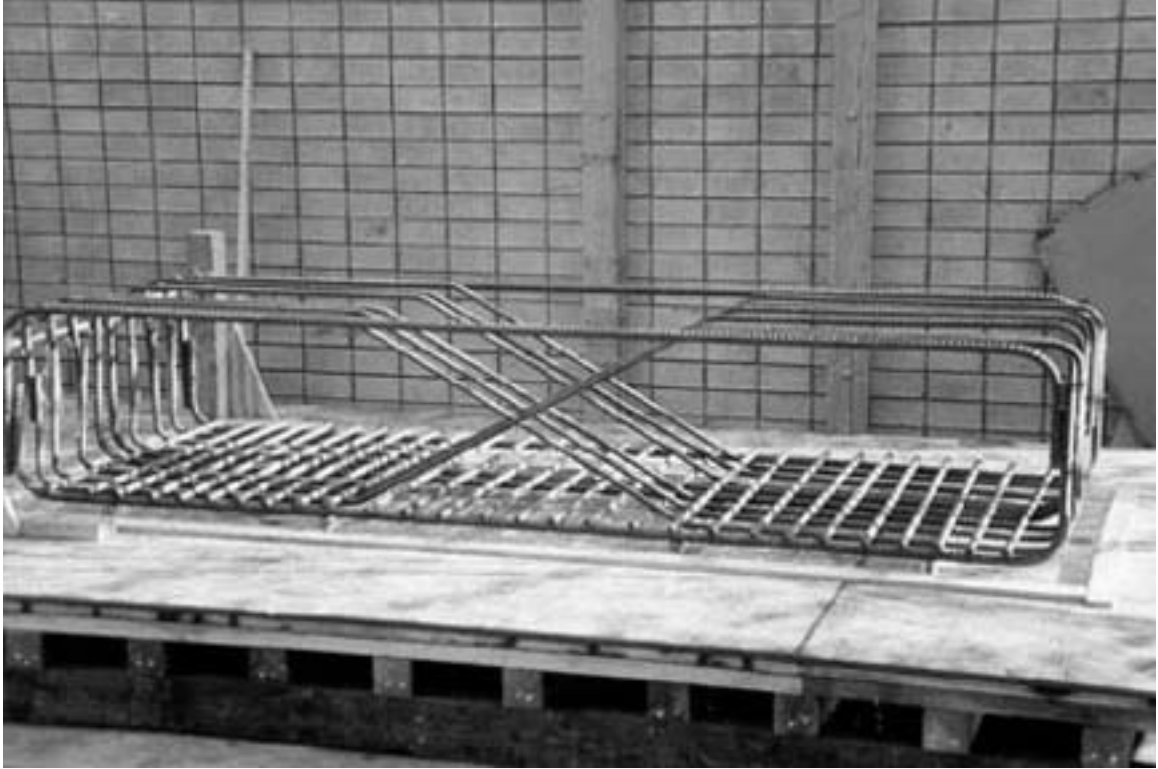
Footing longitudinal bars: No. 8 [D25] U-bars and No. 6 [D19] Z-bars.
